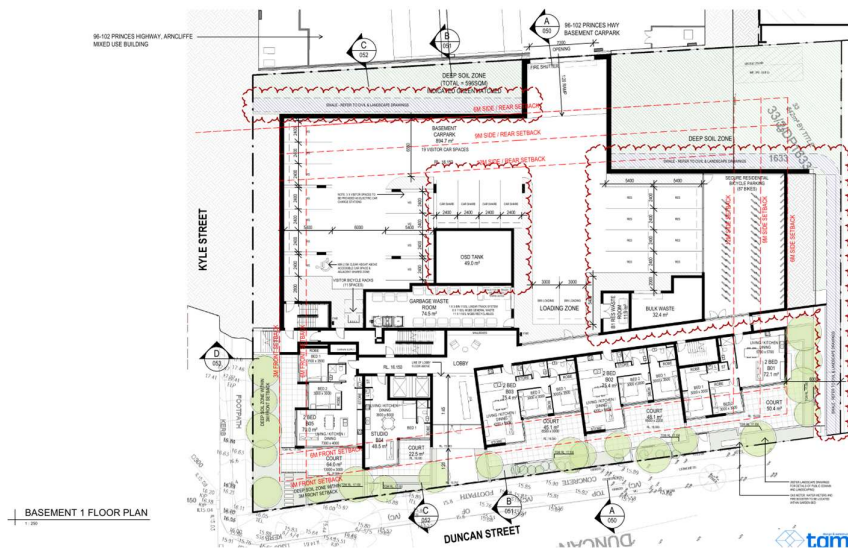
Basement 1 floor plan of the proposed residential flat development.
